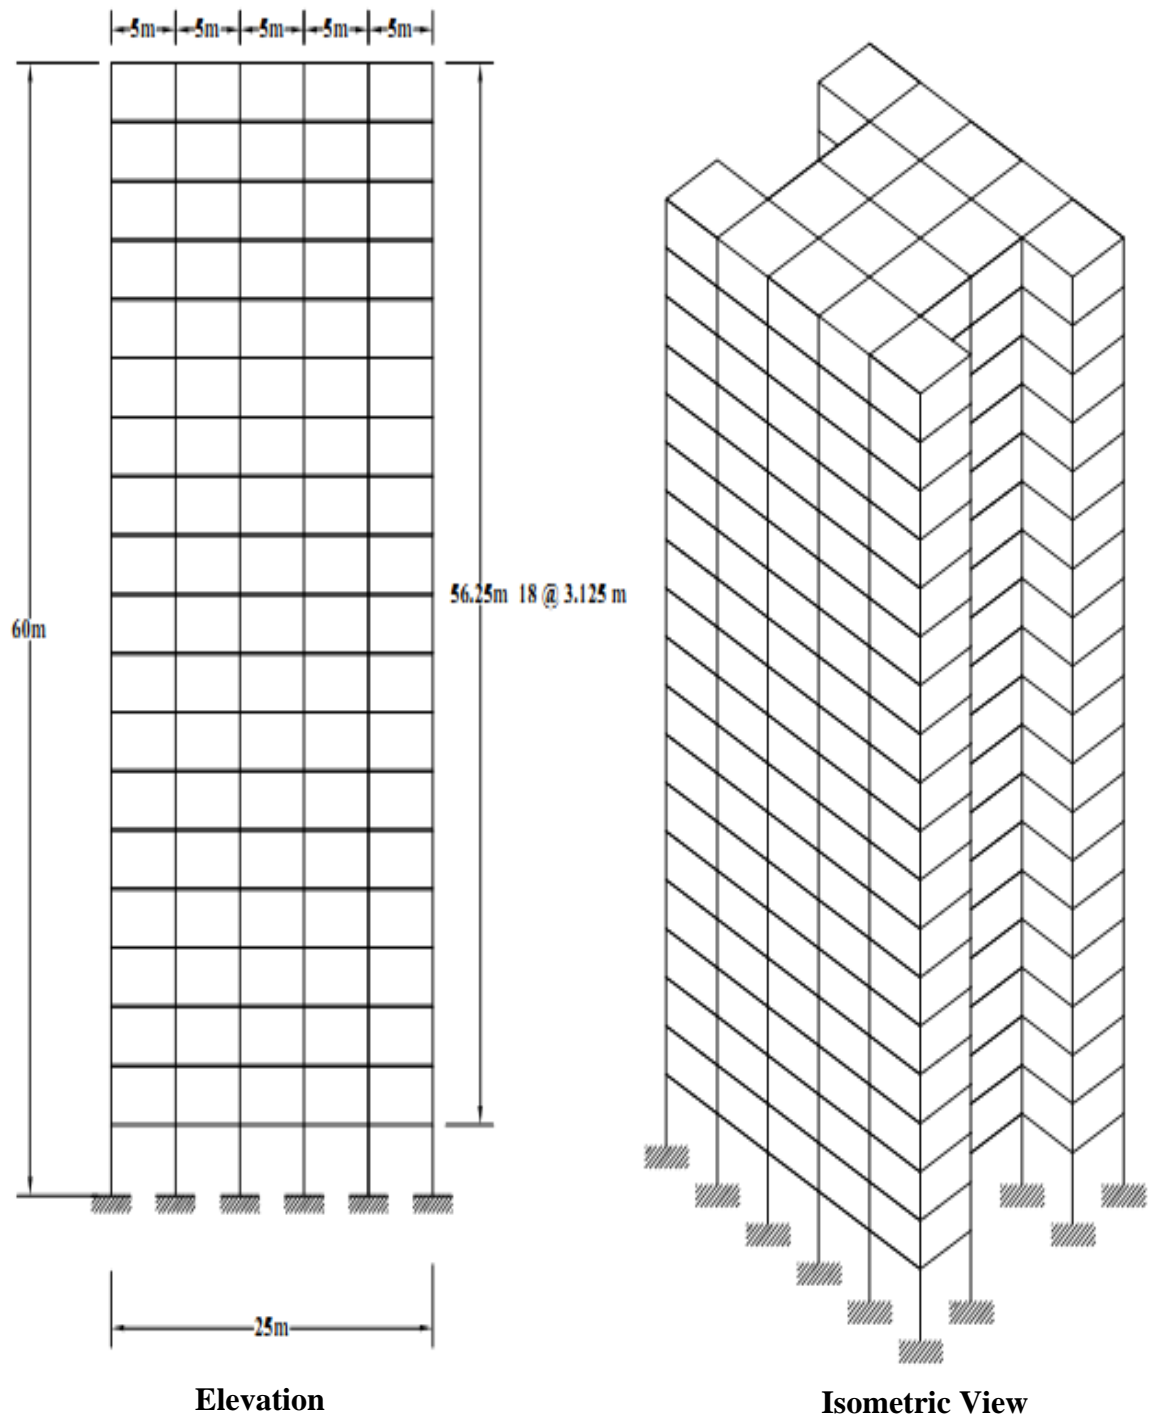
Elevation and isometric view of Square Shape building
